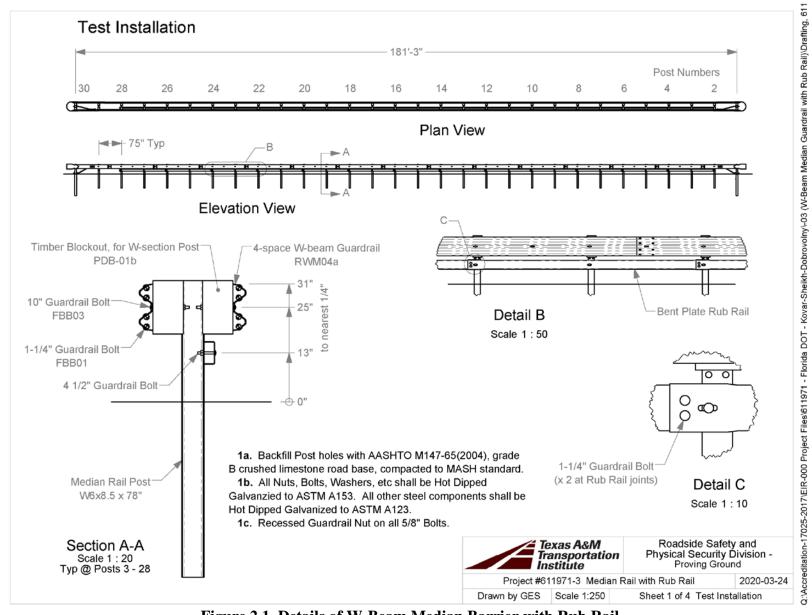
Details of W-Beam Median Barrier with Rub Rail.
